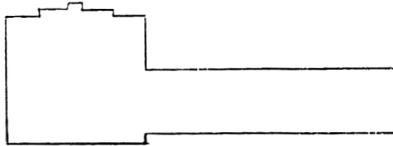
Plans of Offering Rooms in Saqqara Chapels (4)
